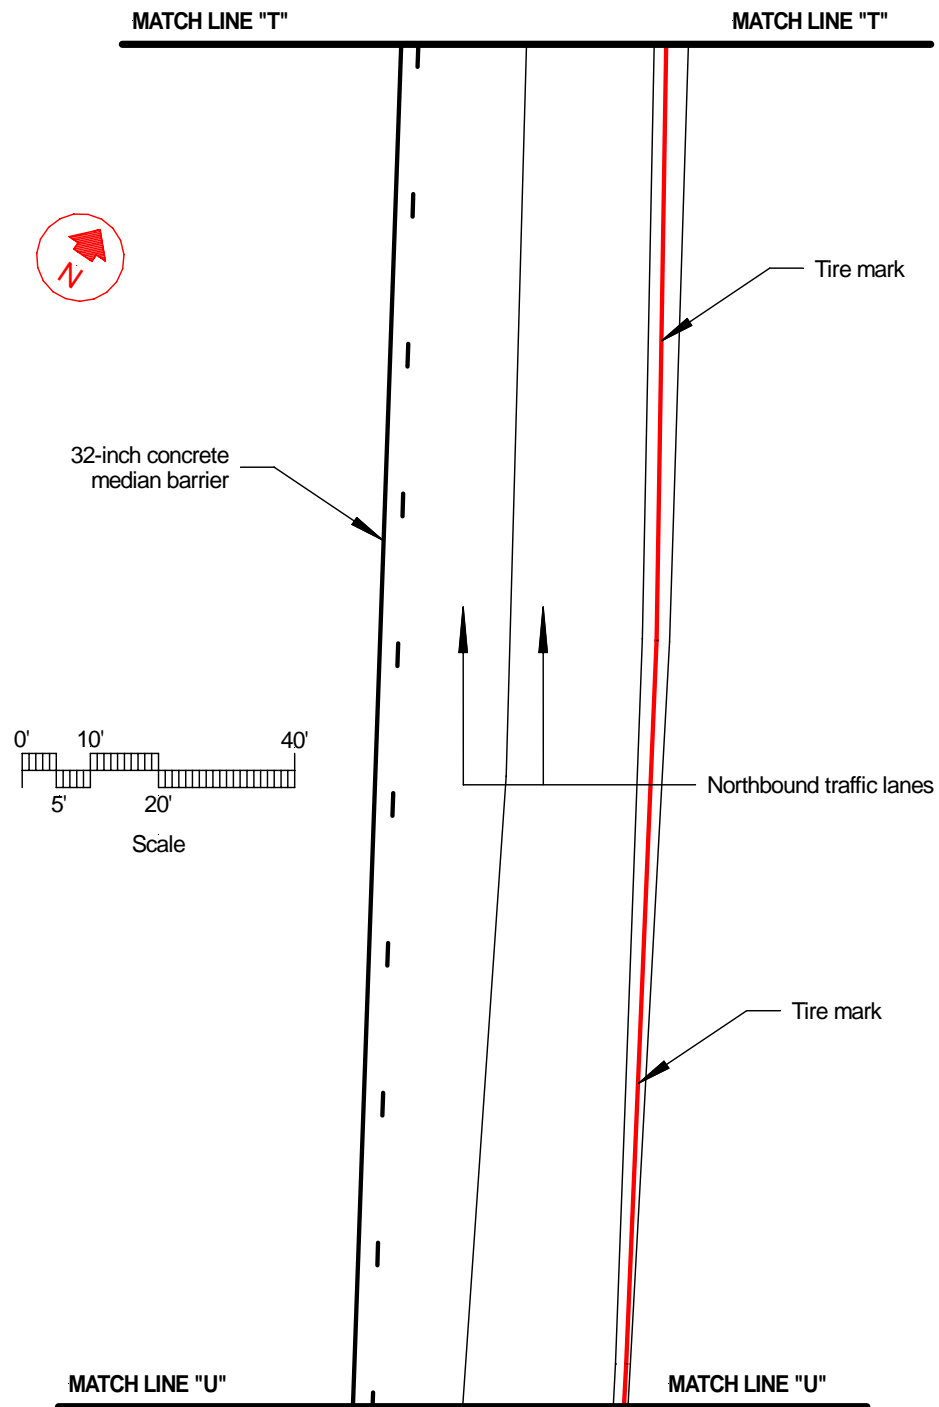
NTSB map of T-U pavement markings and roadway evidence.
